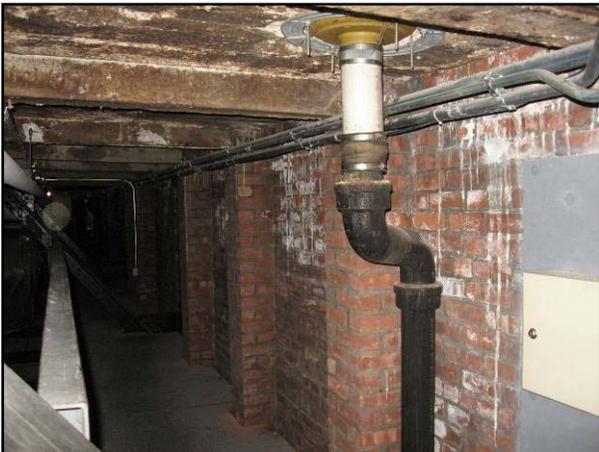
Roof Drain at Great Hall. (Note evidence of leaking around drain at some time in past)
